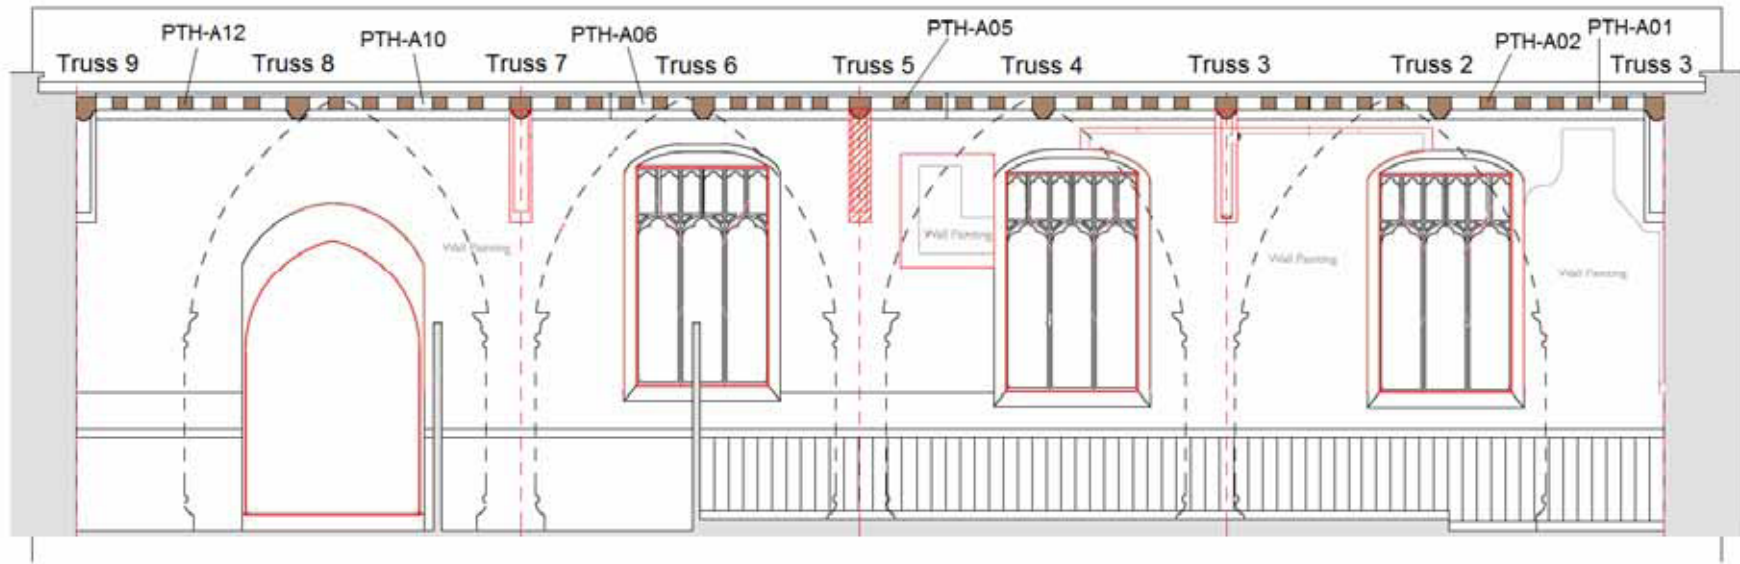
North aisle, section (internal elevation looking north), showing the location of samples PTH-A01–02, PTH-A05–06, PTH-A10 and PTH-A12 (Nicholas Warns Architects Limited)
